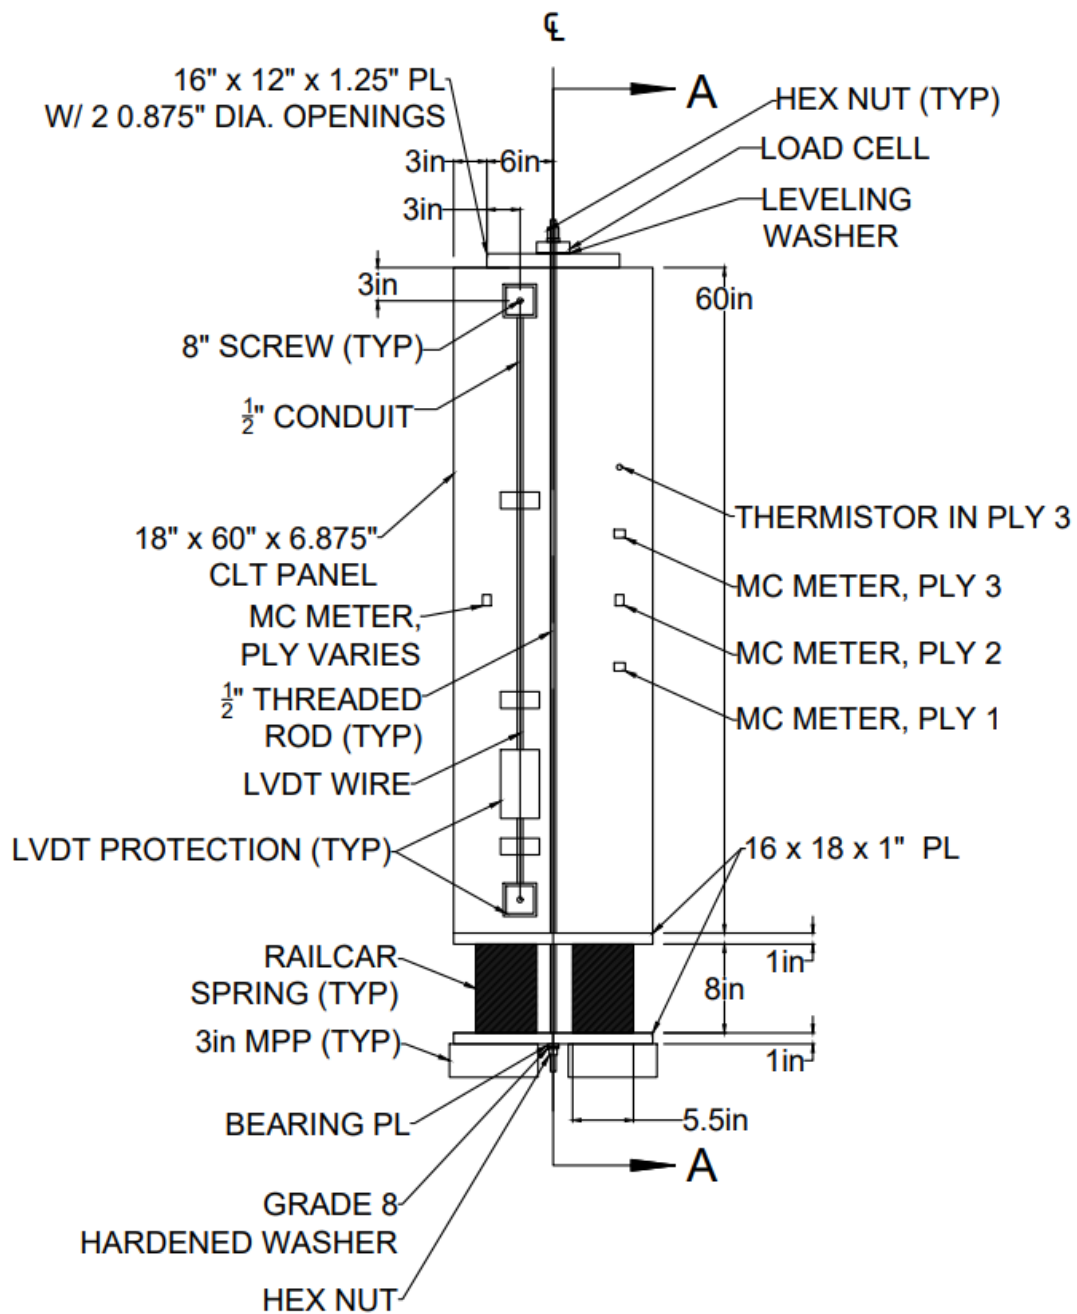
Elevation view of the small-scale CLT specimen design (credit: E. Baas)
